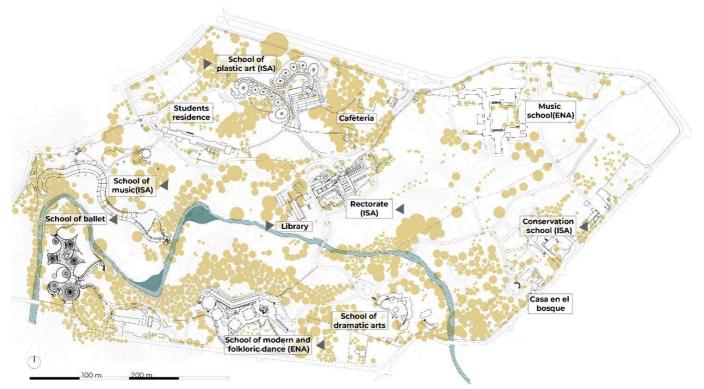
Site plan of National Art Schools pointing out the buildings in which the thermo-hygrometric measurements have been carried out.
